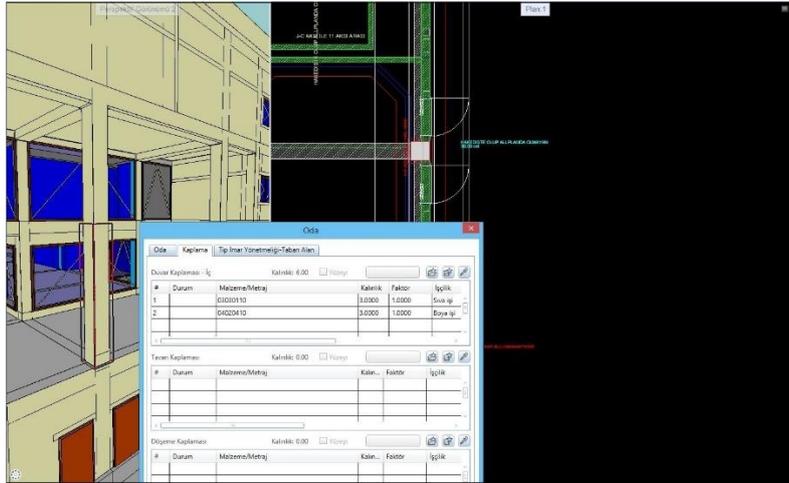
S58 Column at Ground Floor in Allplan Model
